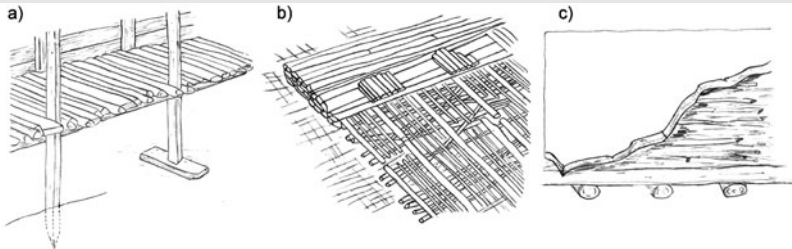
Different kinds of lake-dwelling house floors: a) Elevated floor of a pile dwelling; b) Multi-layered roundwood floor build directly on the ground; c) Wooden floor paved with clay. (Drawings: Olenka Dmytryk)
